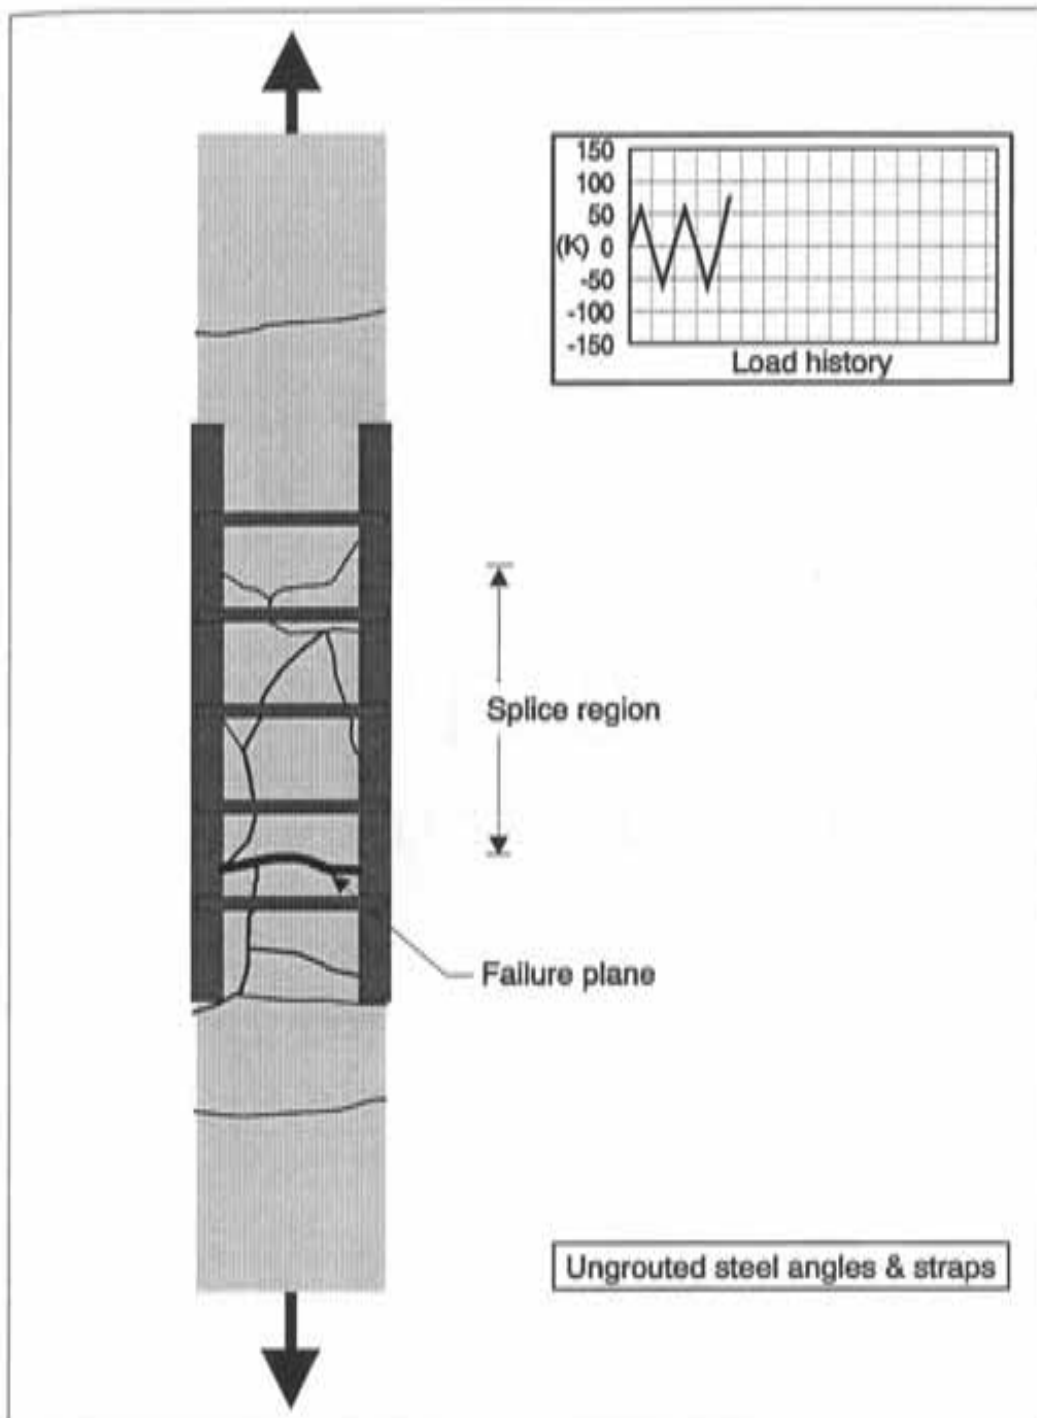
Crack pattern in specimen U-SS6-UG-1 at failure
